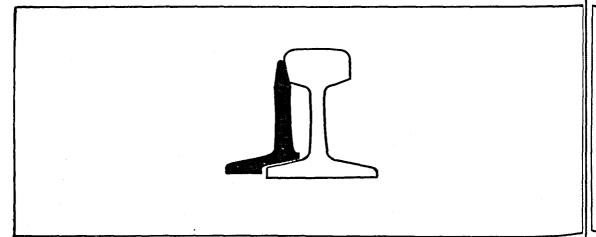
POINT BASE & SWITCH TOE SECTIONS
